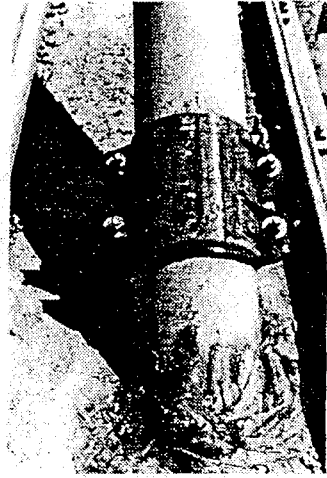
Guide Pipe Repairs - Talmadge Bridge
